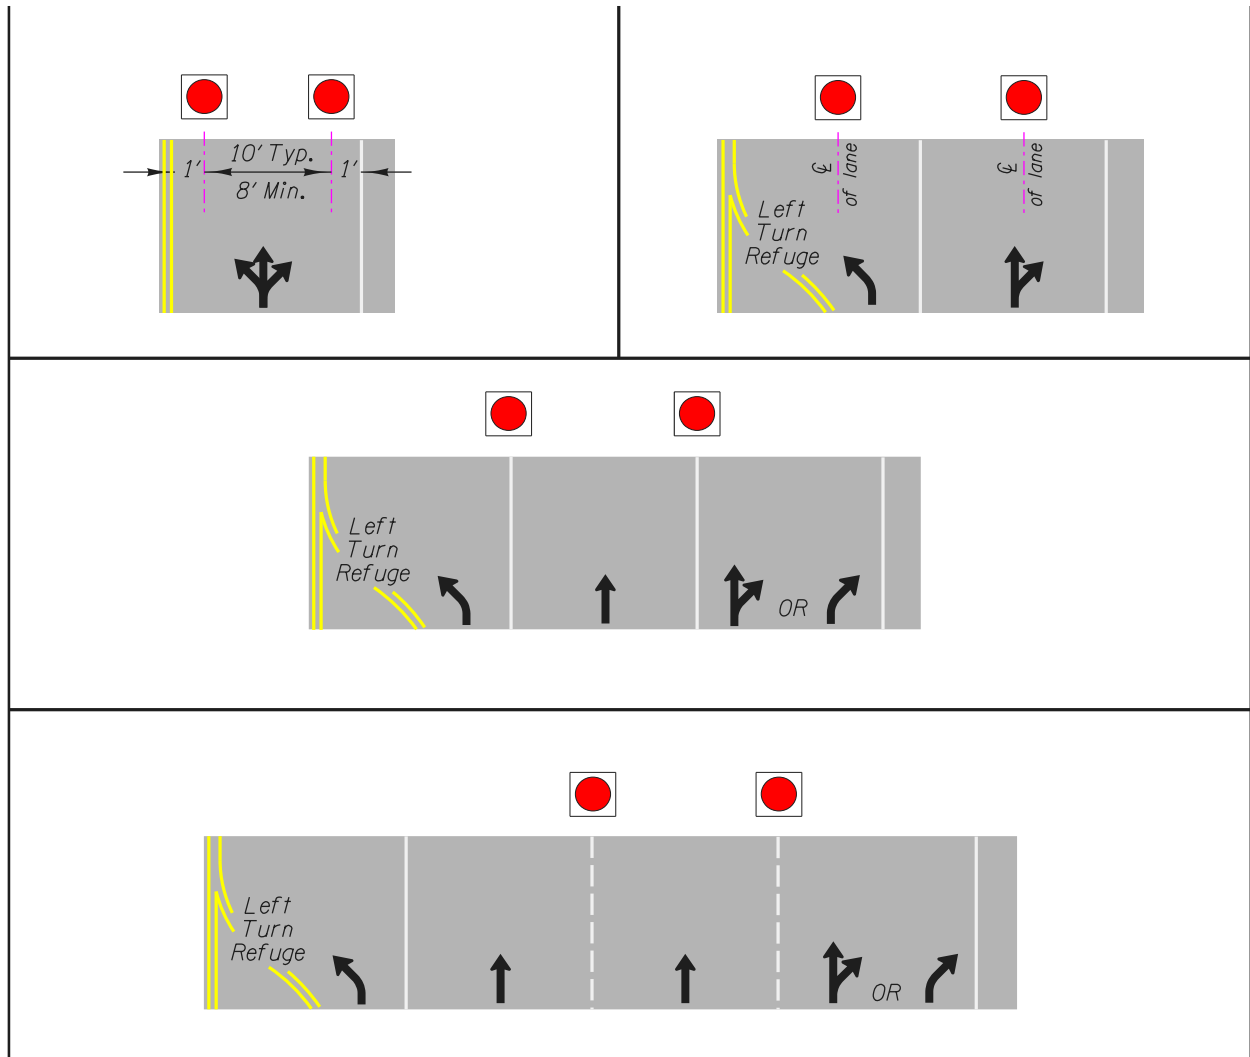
| Intersection Control Beacon, Mast Arm Example 1
